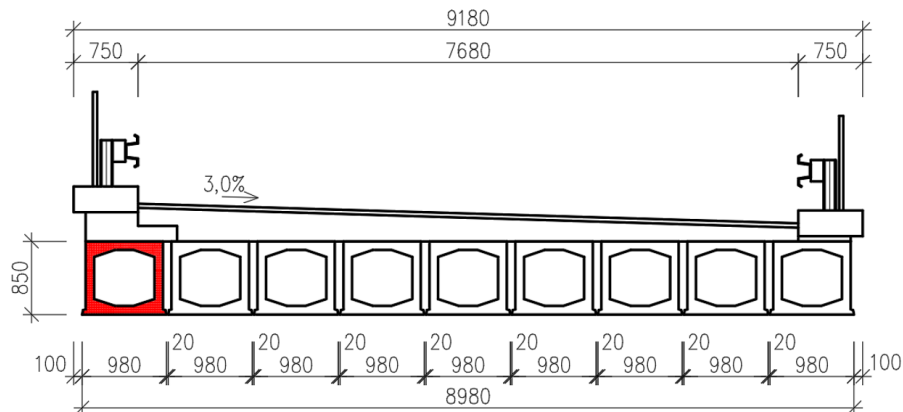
Cross-section of bridge (critical beam marked in red).
